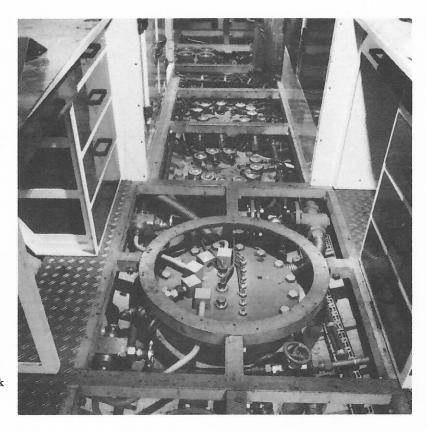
Inner hatch of the connection domes and below-deck installation of instruments and pipework.
